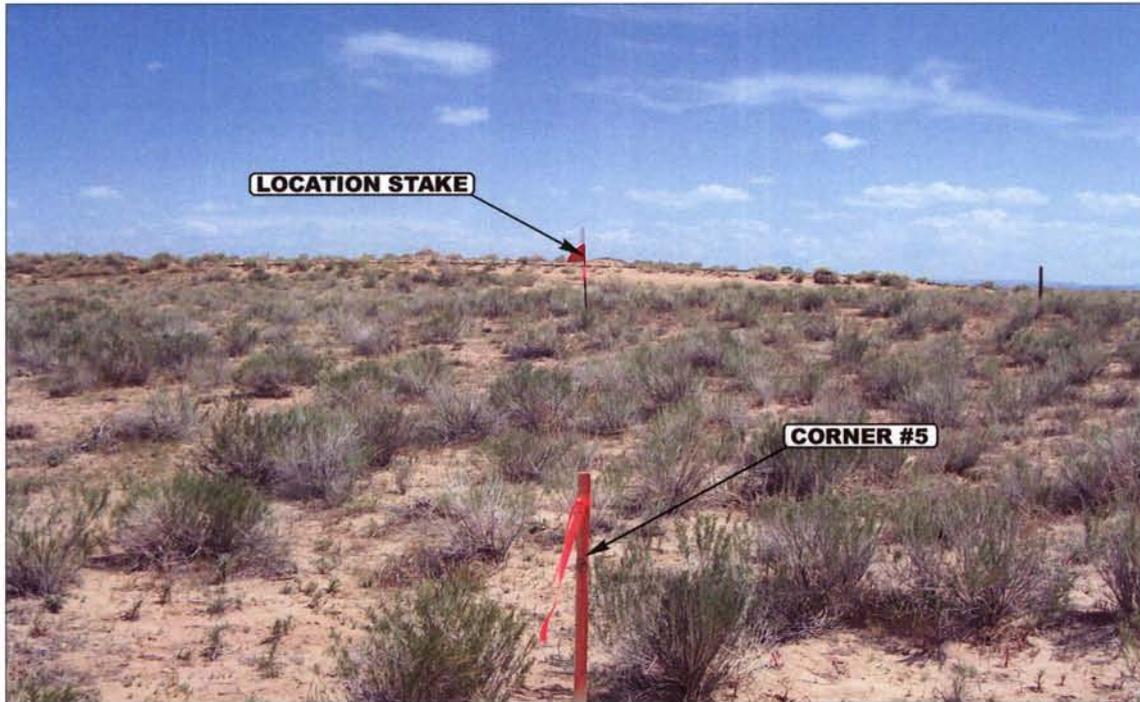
PHOTO: VIEW FROM CORNER #5 TO LOCATION STAKE
